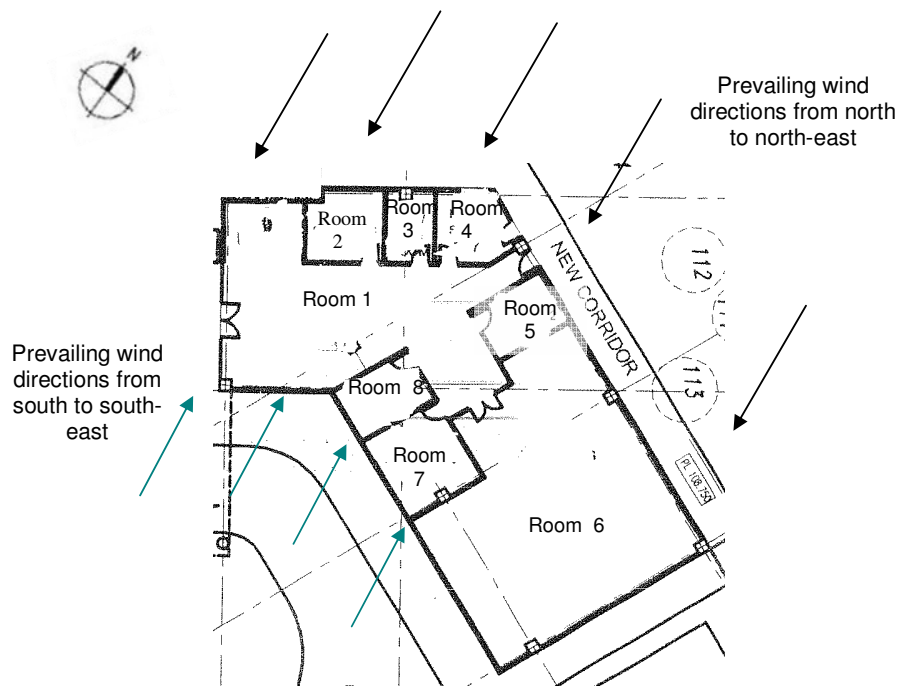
Building layout shows not all rooms with window openings facing the north and south directions. Room 2 to Room 5 would only have prevailing wind in one direction. Only Room 1 and 6 can be considered meeting the requirement 1-4 (a)
